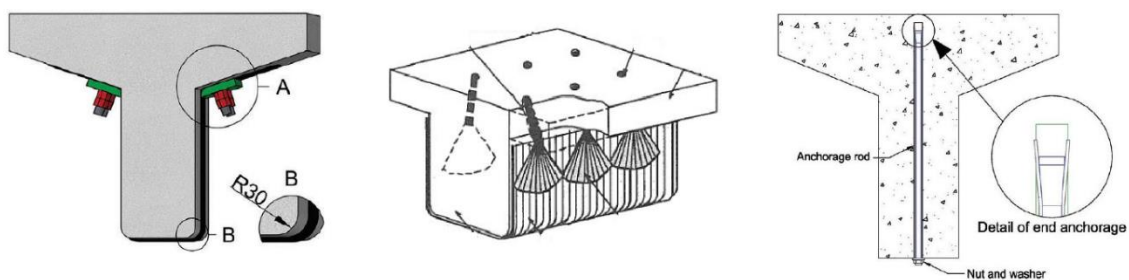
CFRP-Strengthening of a beam with steel plate and anchors (left, taken from [31]), CFRP with spread up ends for anchoring (center, taken from [32]) and post-installed anchor for shear-strengthening of a beam (right, taken from [32]).
